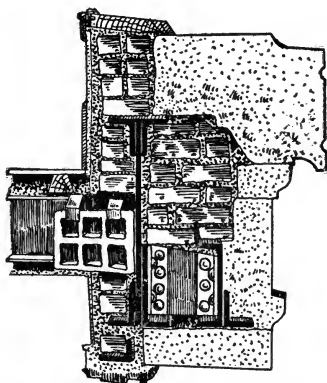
Spandrel Section, Fourth Floor. Broadway Chambers, New York.
